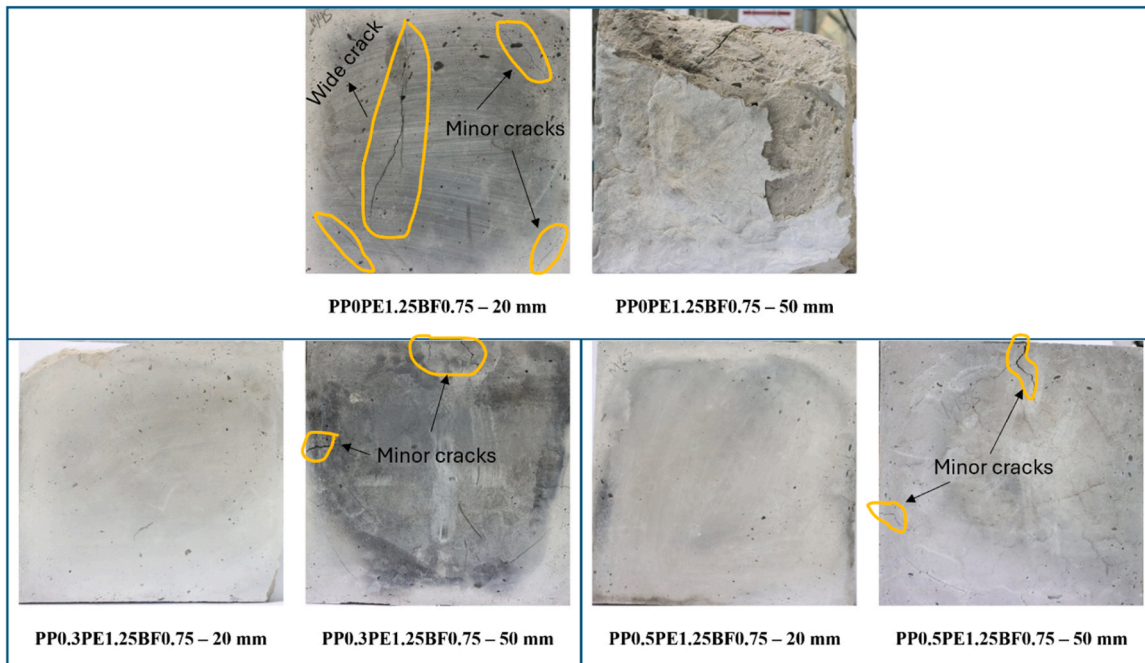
Mix PP0PE1.25BF0.75, PP0.3PE1.25BF0.75 and PP0.5PE1.25BF0.75 – 300 × 300 mm panel specimens after 3-D exposure test.
